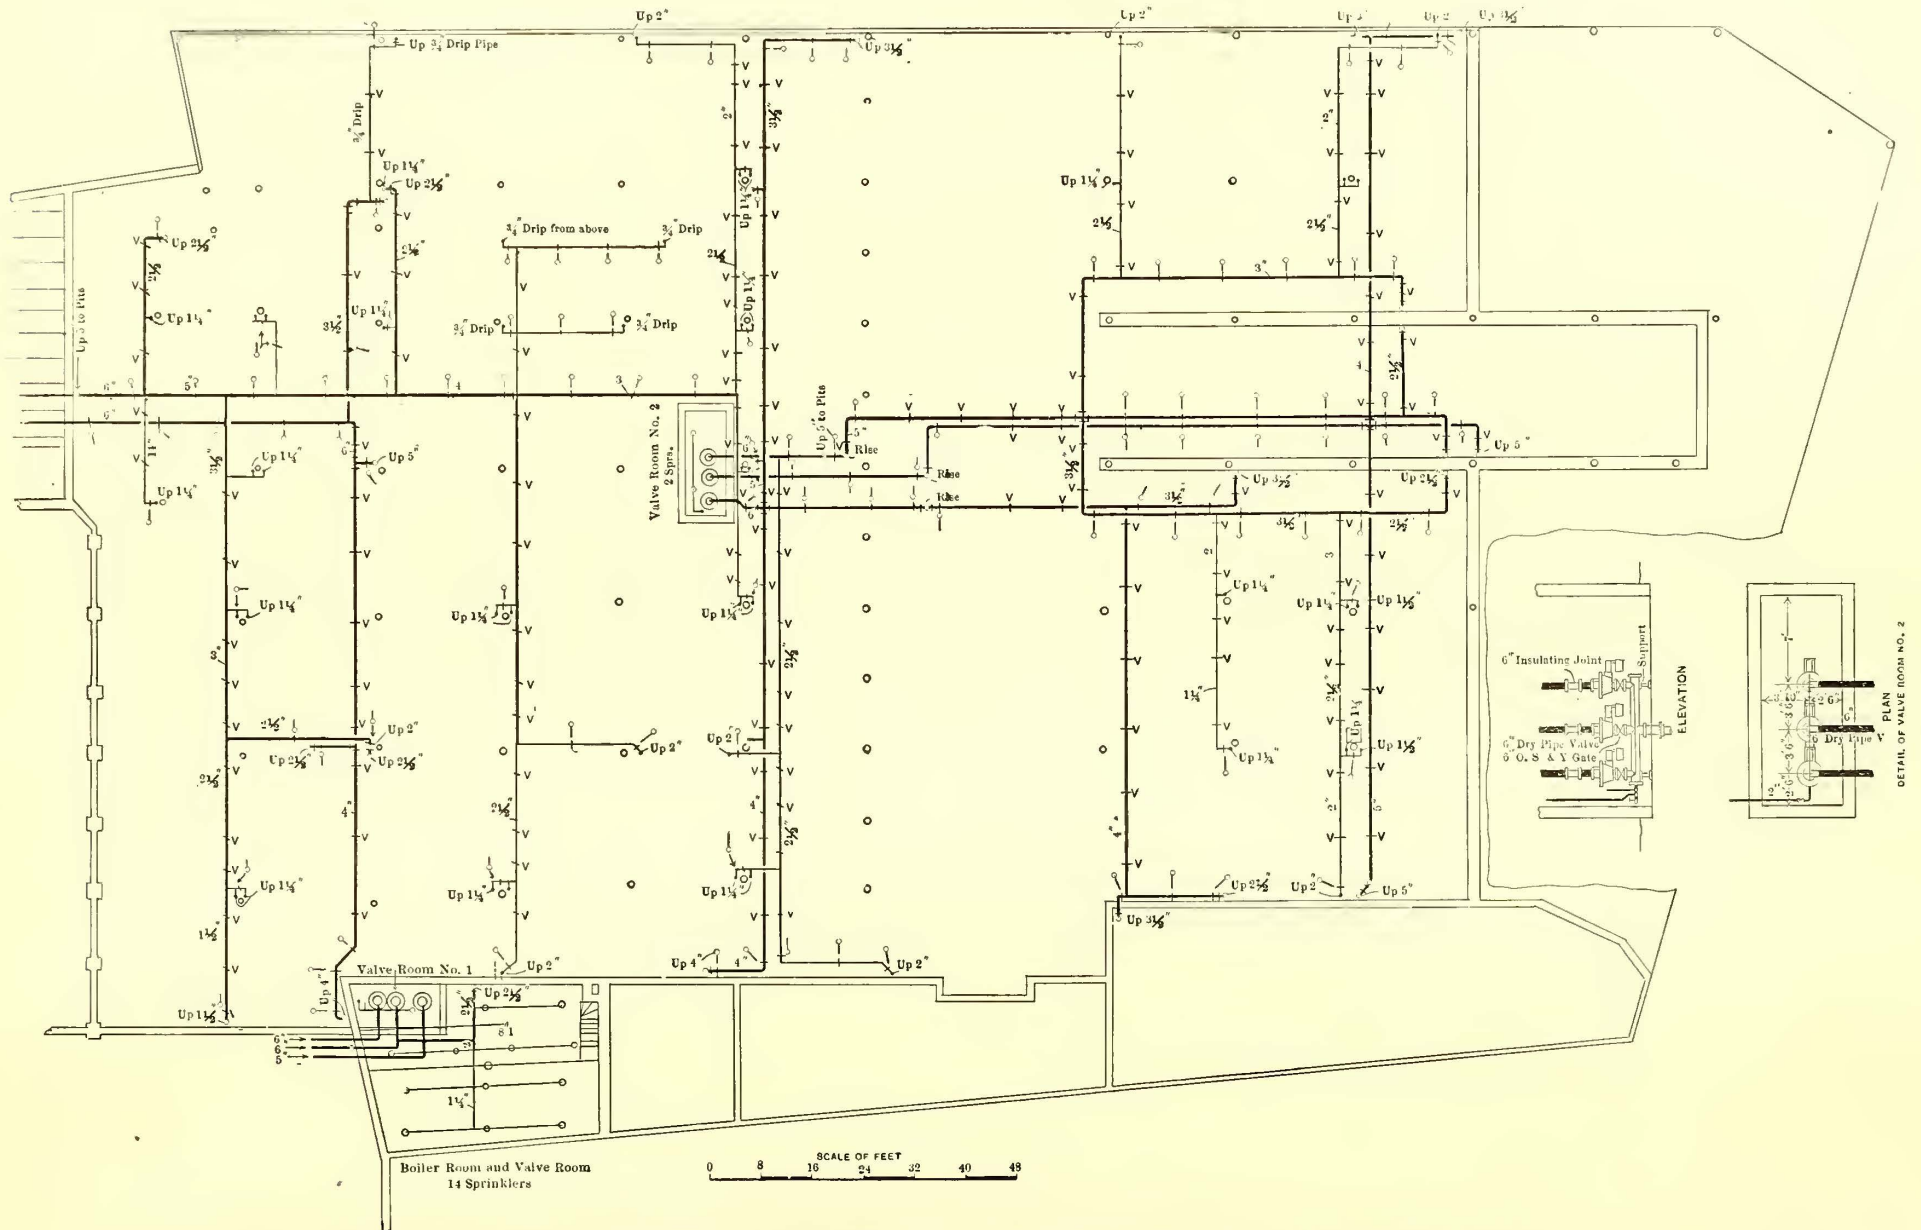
Fire Protection of Milton Car House—General Plan, Showing Piping Layout and Valve Locations
